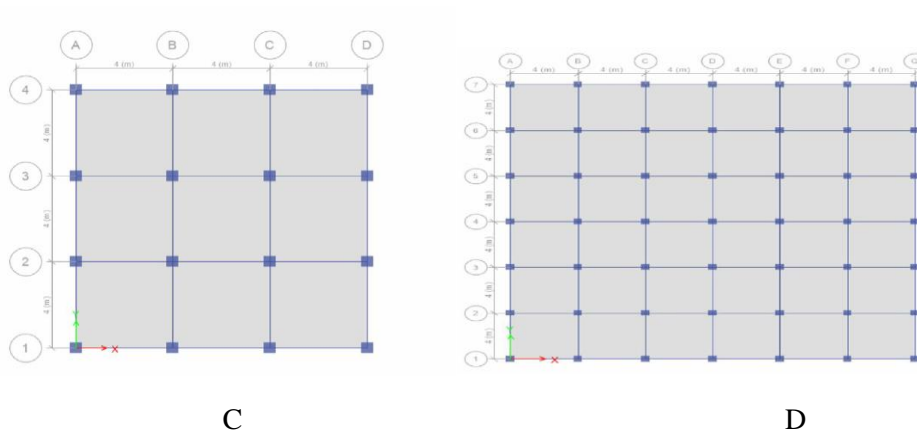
2: 3*3 and 6*6 bays of 4m width regular frames floor plan
